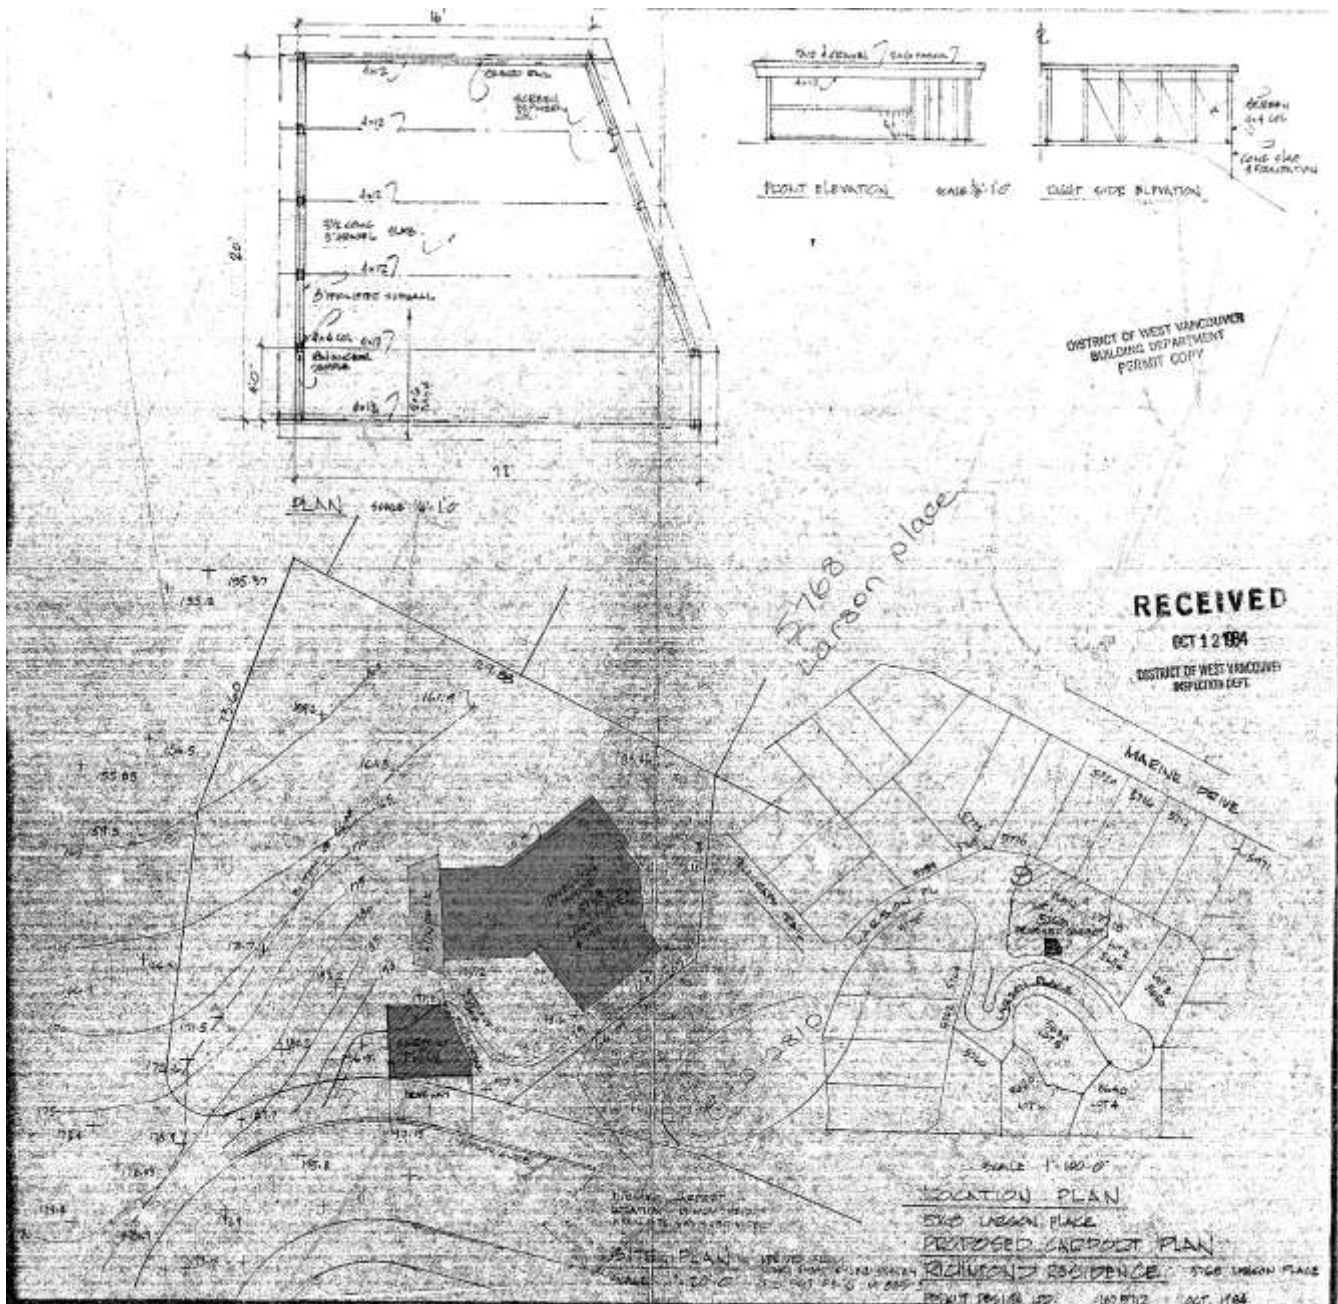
1984 Permit Drawing for new car port on behalf of John Francis Richmond - West Vancouver Building Records
